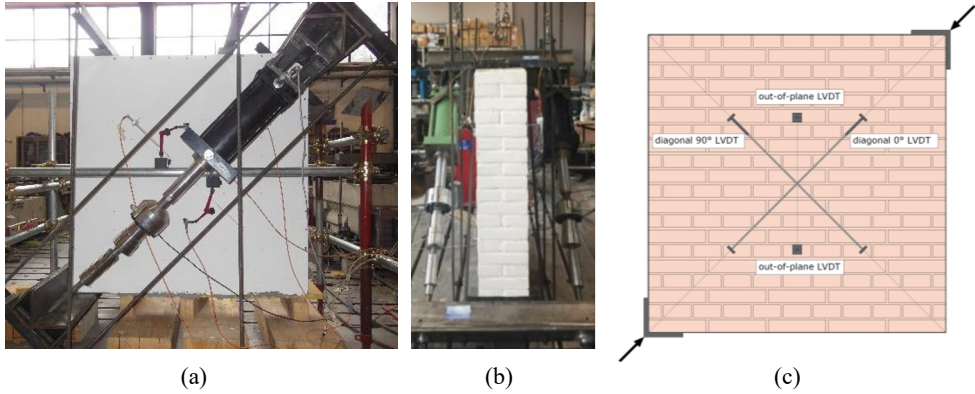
Test set-up: (a) front view, (b) side view and (c) LVDT's layout.
